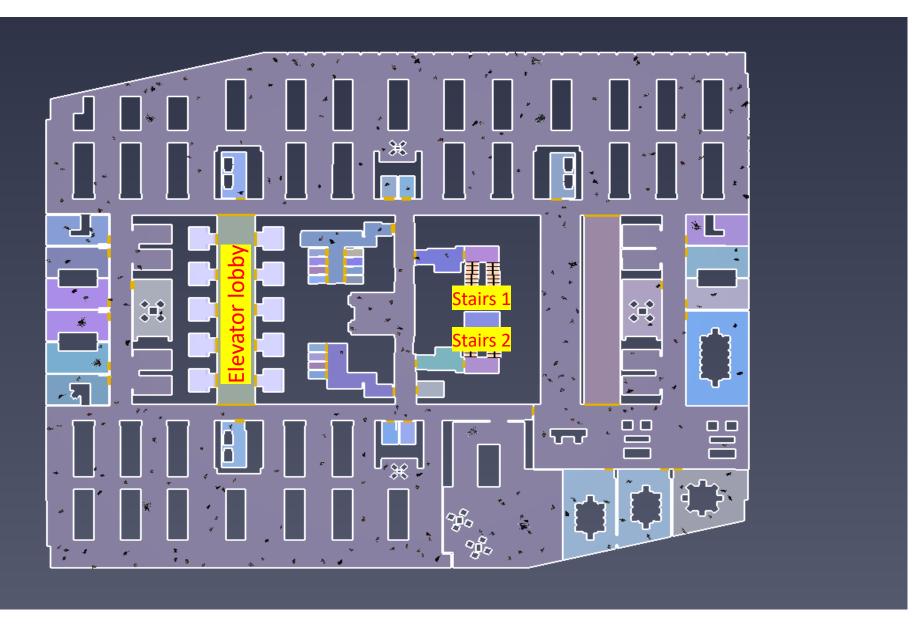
Geometric layout of one of the floors occupying the high-rise level offices in the building
